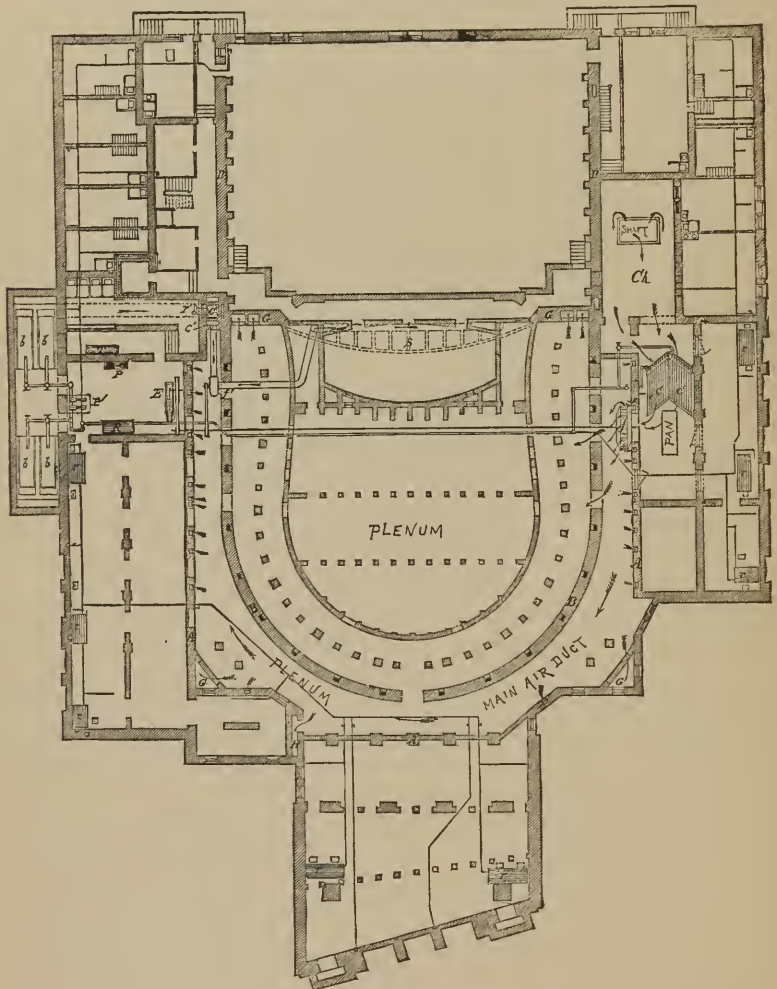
METROPOLITAN OPERA HOUSE, NEW YORK CITY.—GROUND PLAN.
